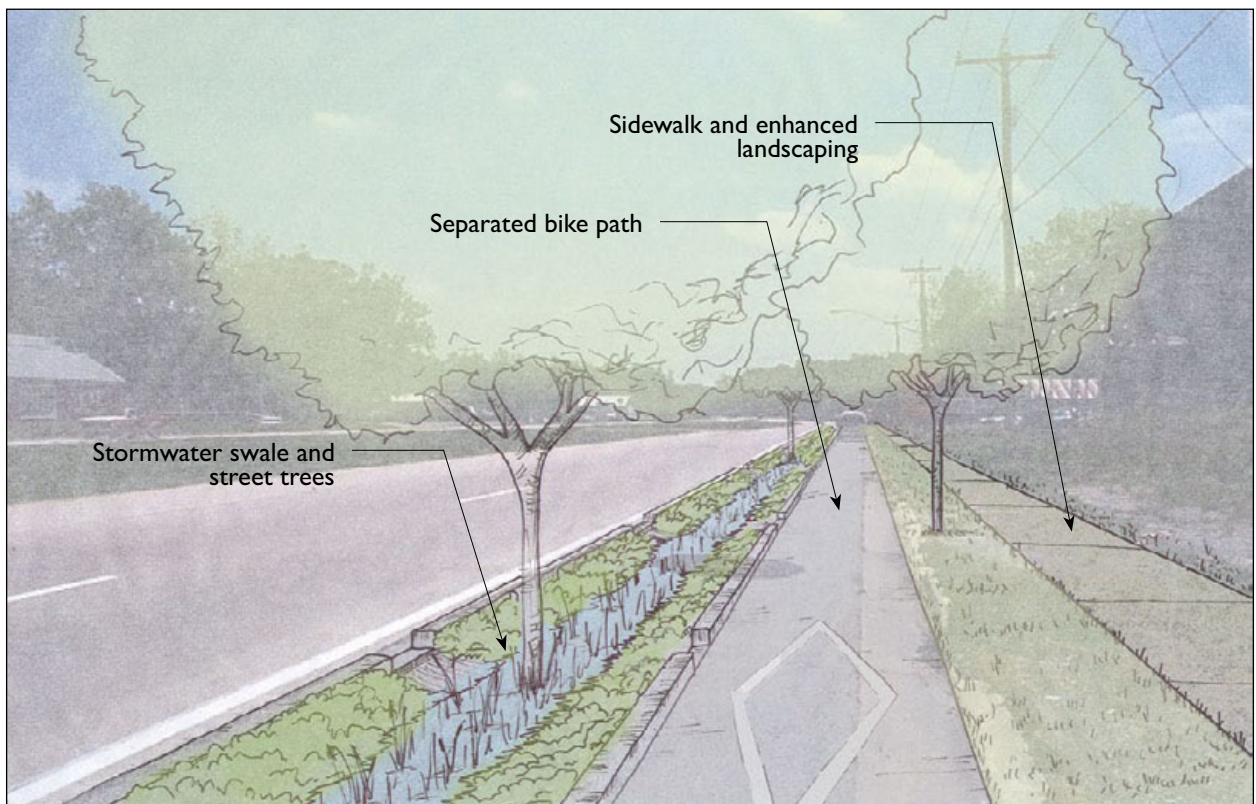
Retrofit potential: A new stormwater swale and street trees combined with a separated bike path and sidewalk system.
